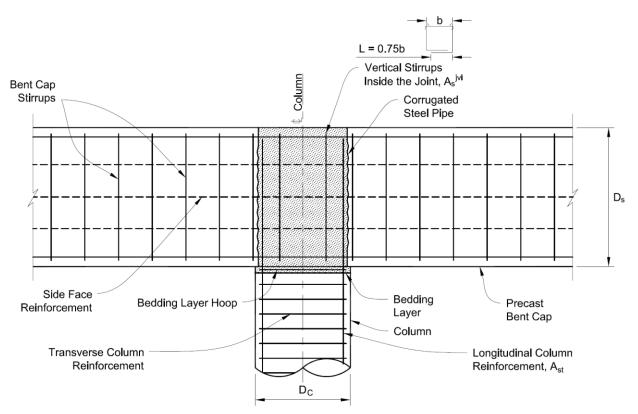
Cap Pocket Joint Shear Reinforcement Details (Elevation)—SDC A
